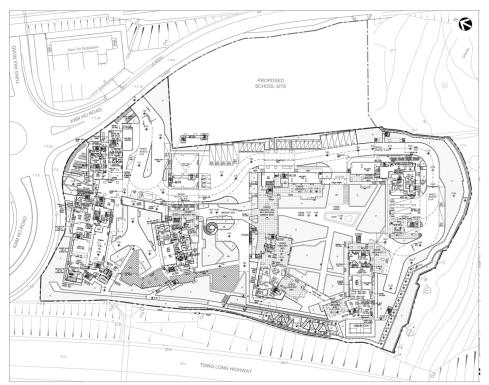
Proposed Scheme – First Floor Layout for Block A and Upper Ground Floor Layout for Block B, C, D & E
